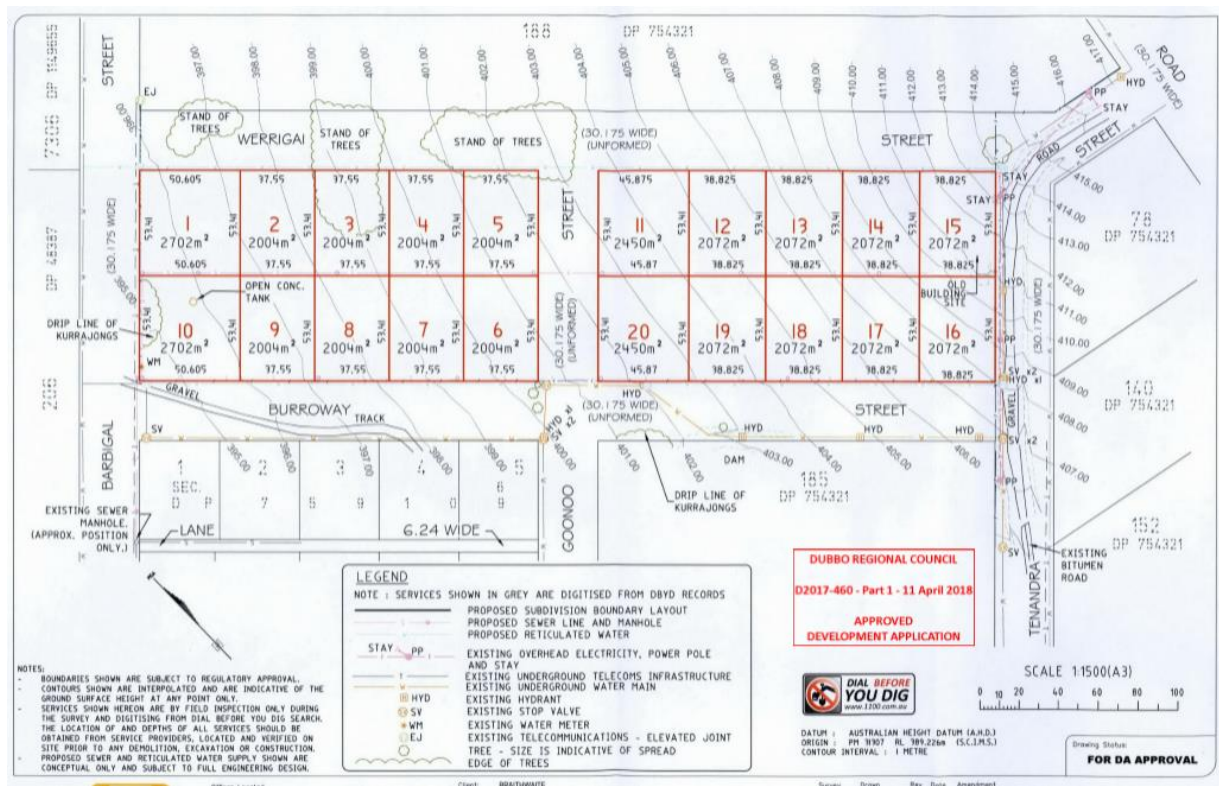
D2017/460 20 Lot Subdivision, Tenandra Street Wongarbron – Approved Subdivision Plan
